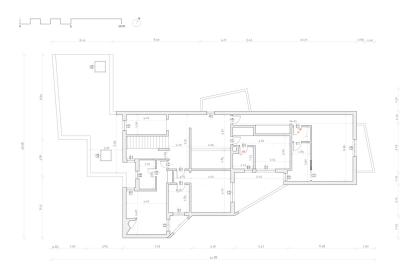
Plan of the second floor of Casa Siza Vieira de Castro
